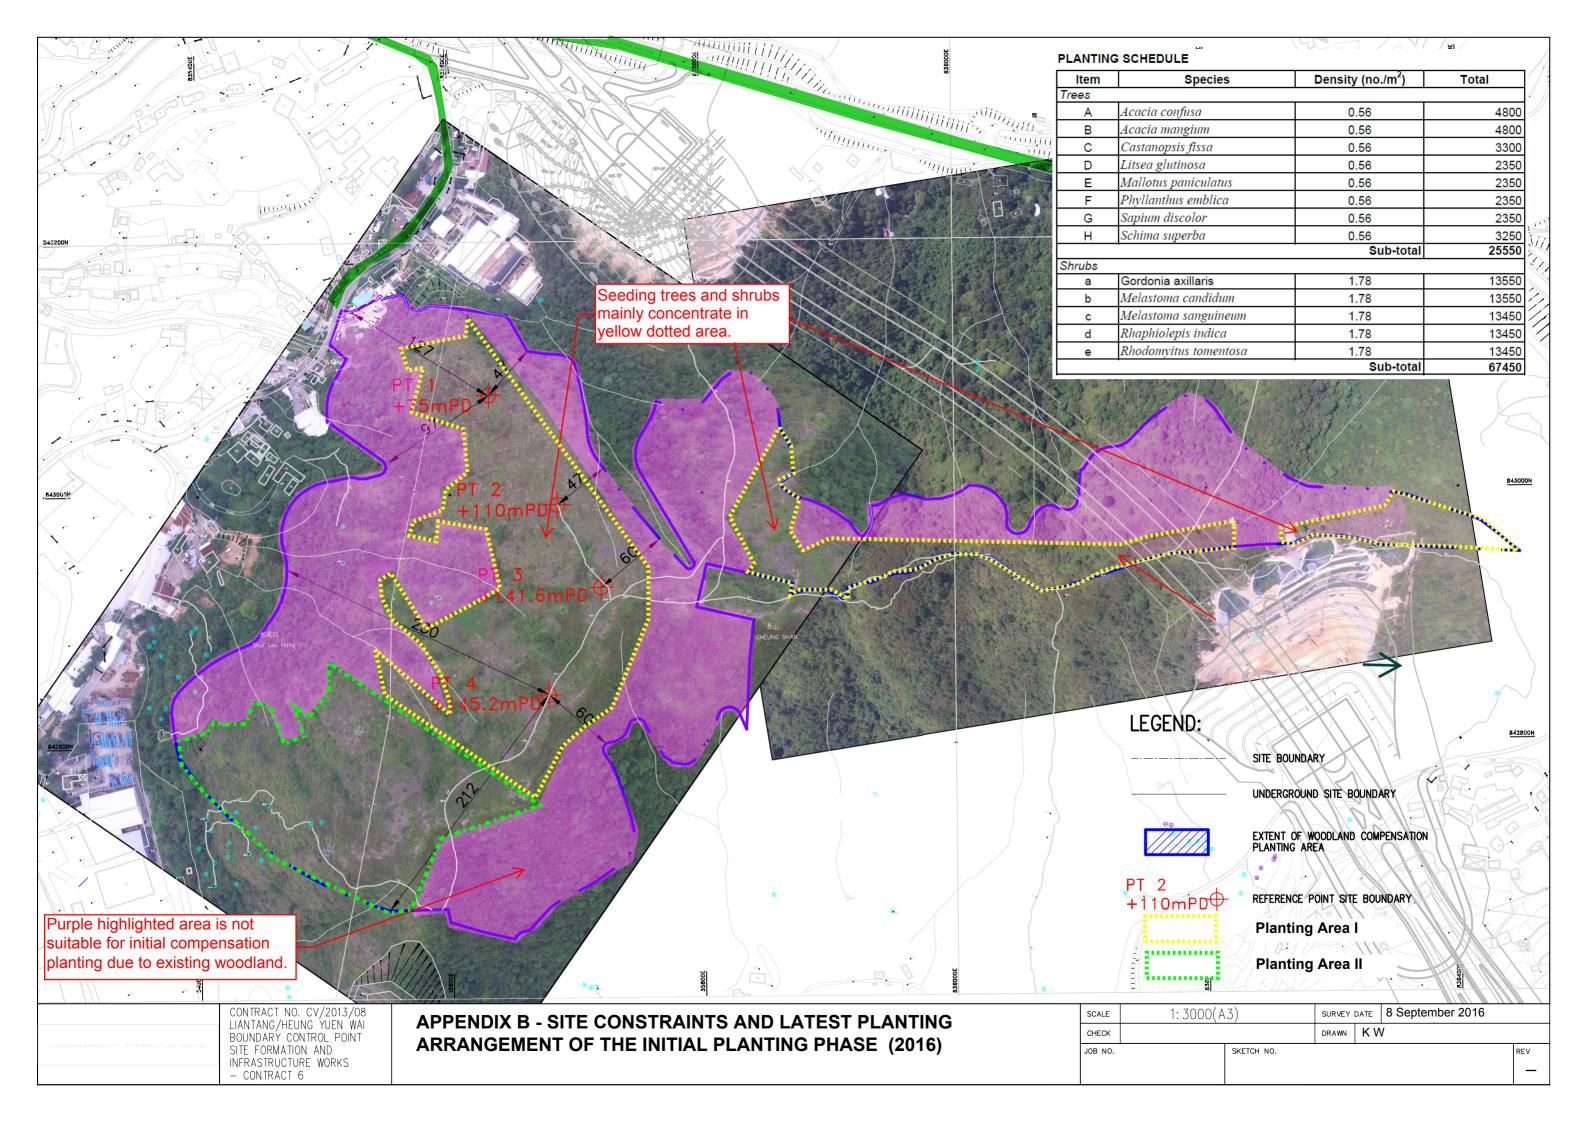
/SK7037 of the Woodland Compensation Plan
